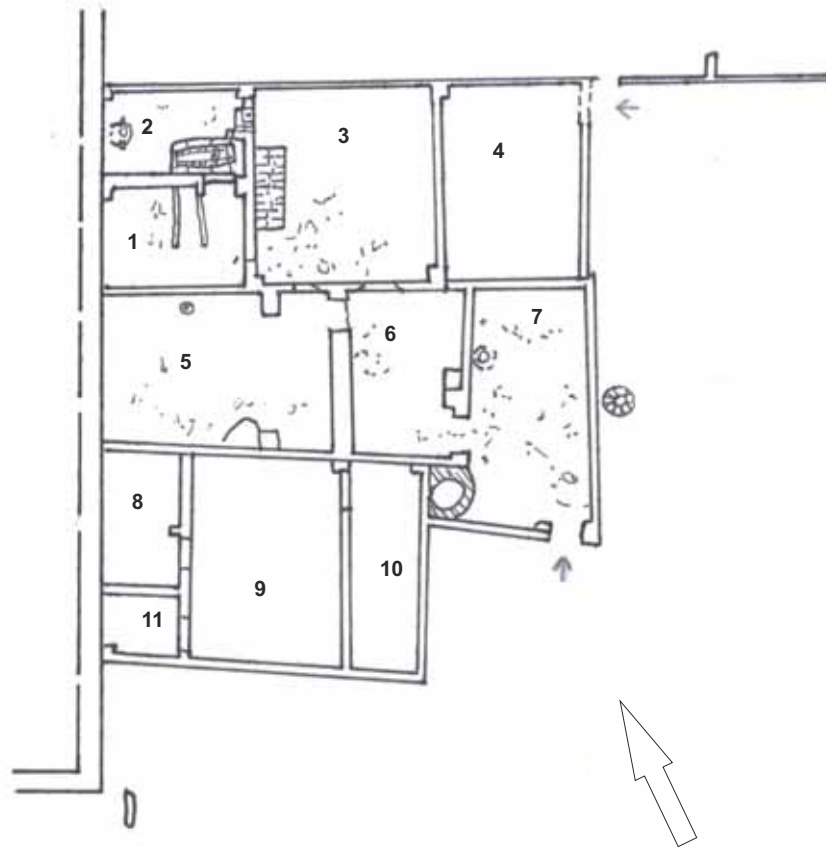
House P47.6. in Amarna (after Borchardt and Ricke 1980, plan 29) (not to scale)
